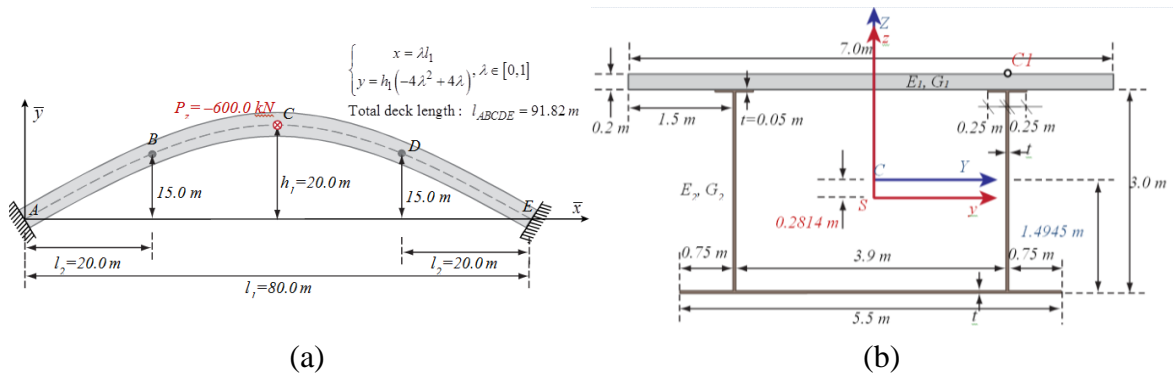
Plan view (a) and composite cross section (b) of curved bridge deck.
